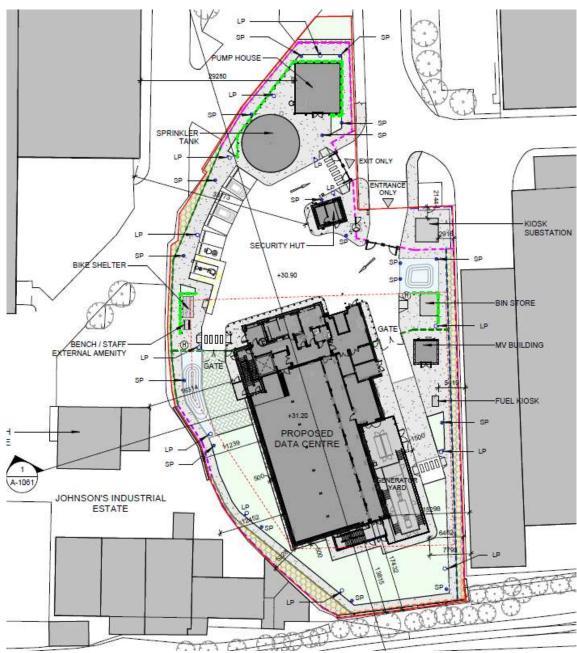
Proposed Site Plan (please note – a larger version of plan can be found in the Committee Plan Pack)
